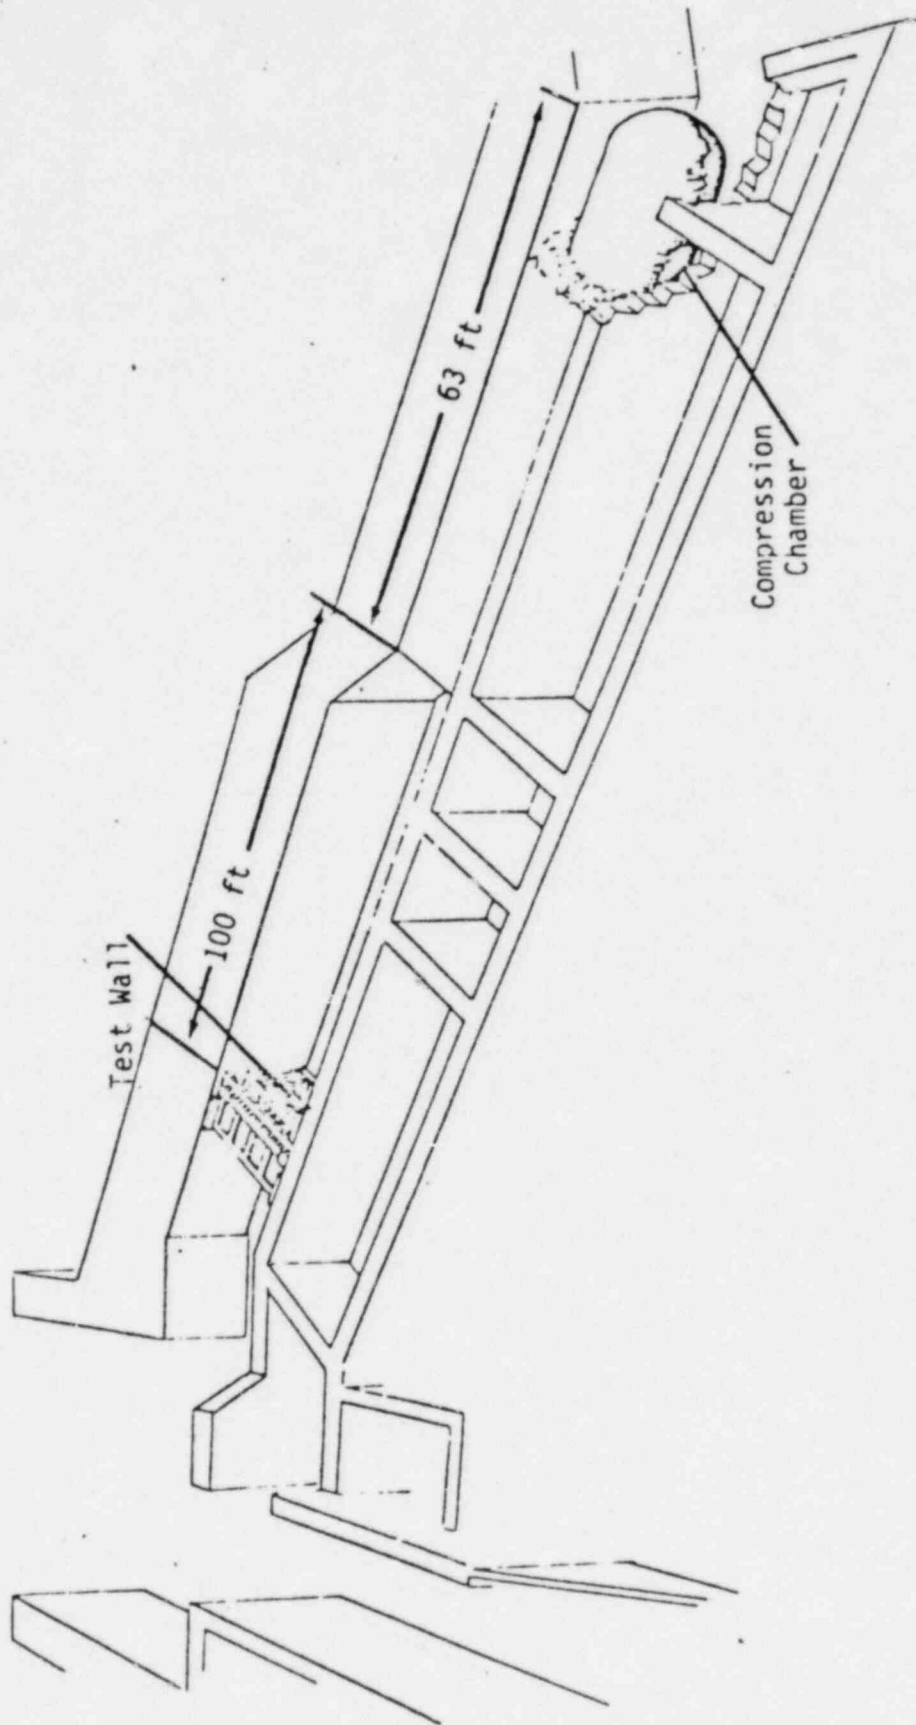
Cutaway view of shock tunnel showing wall in place.
